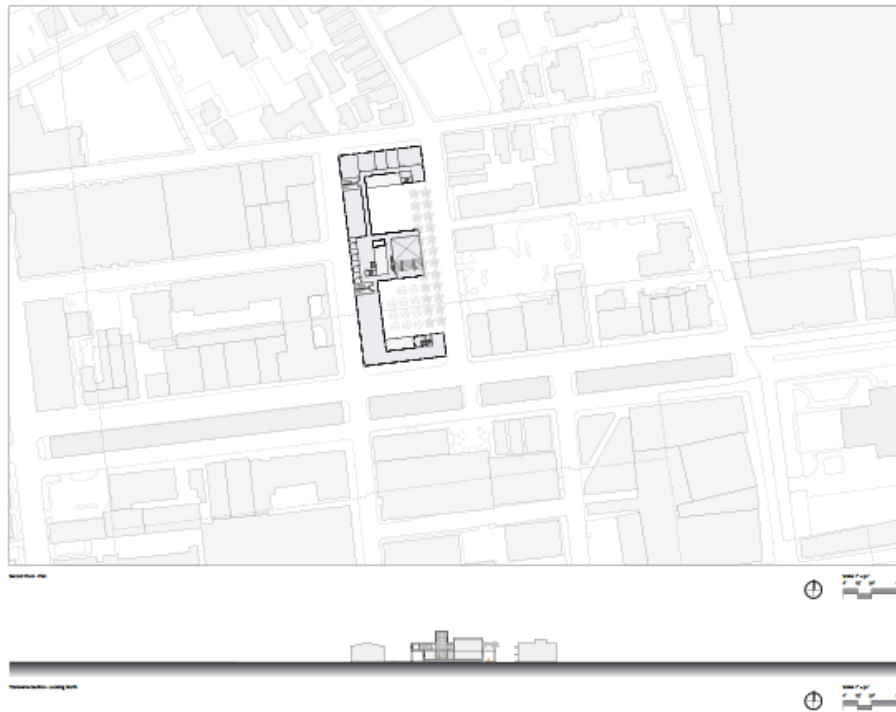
First Floor Plan and East/West Section of Sigma
